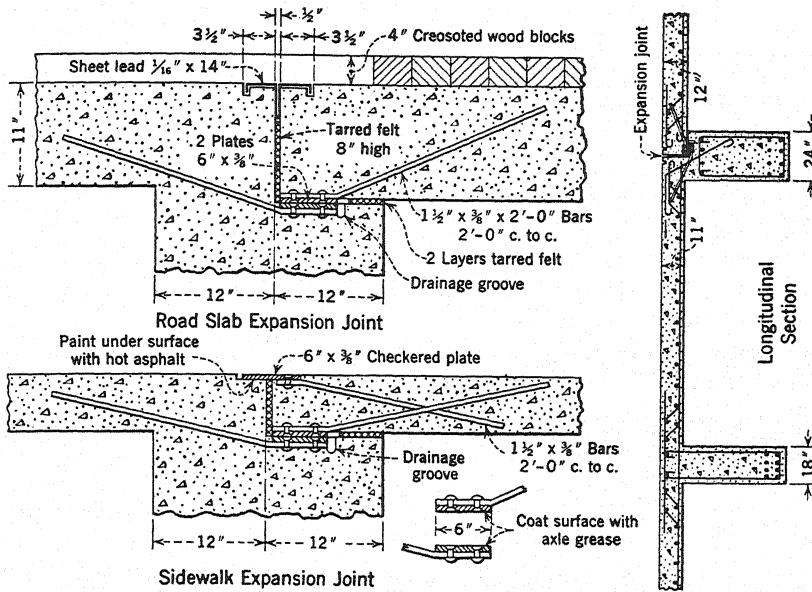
Expansion Joint and Bearing for Deck Slab of Arch Bridge. (See p. 378.)
